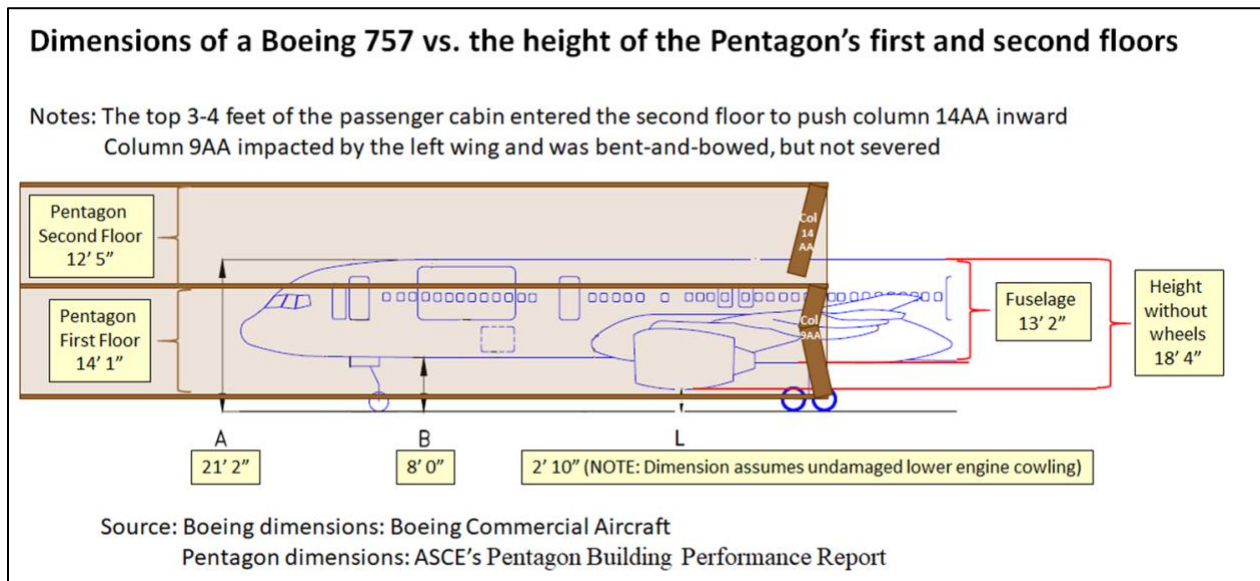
Dimension of a Boeing 757 aligned with impact damage at column 9AA and Column 14AA
